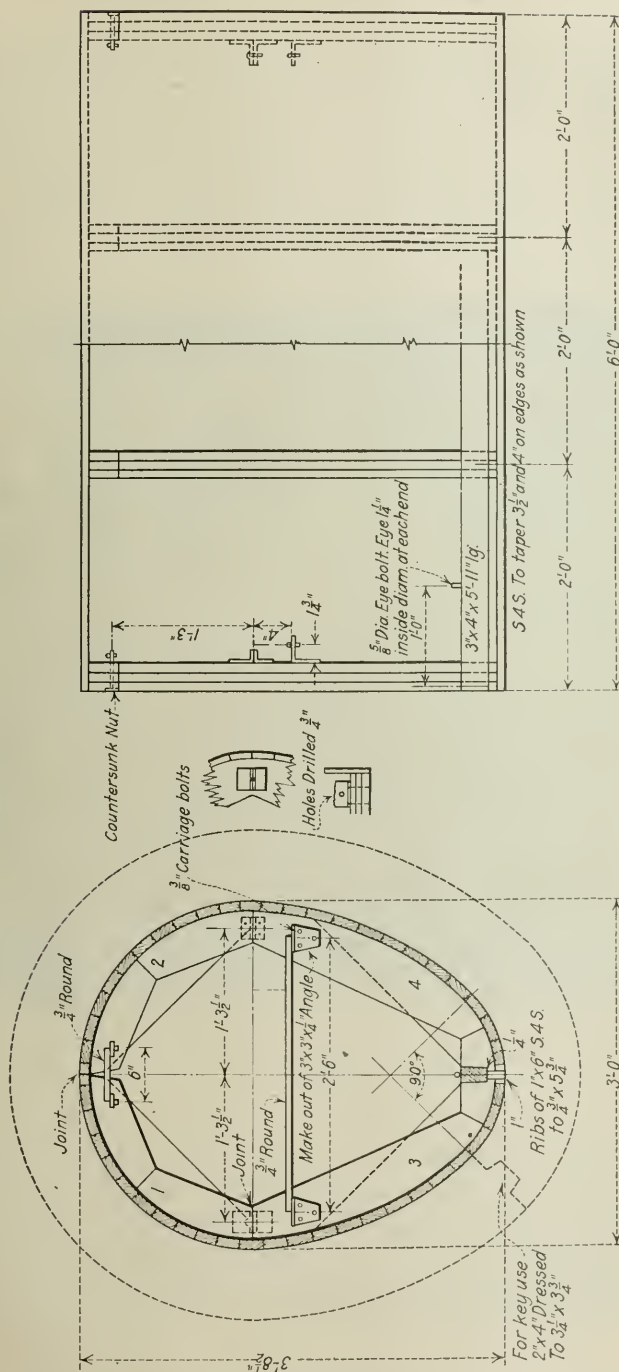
North Shore Sewer. Built-up Wooden Forms, 36 in. Section in Tunnel. Contract No. 3.
